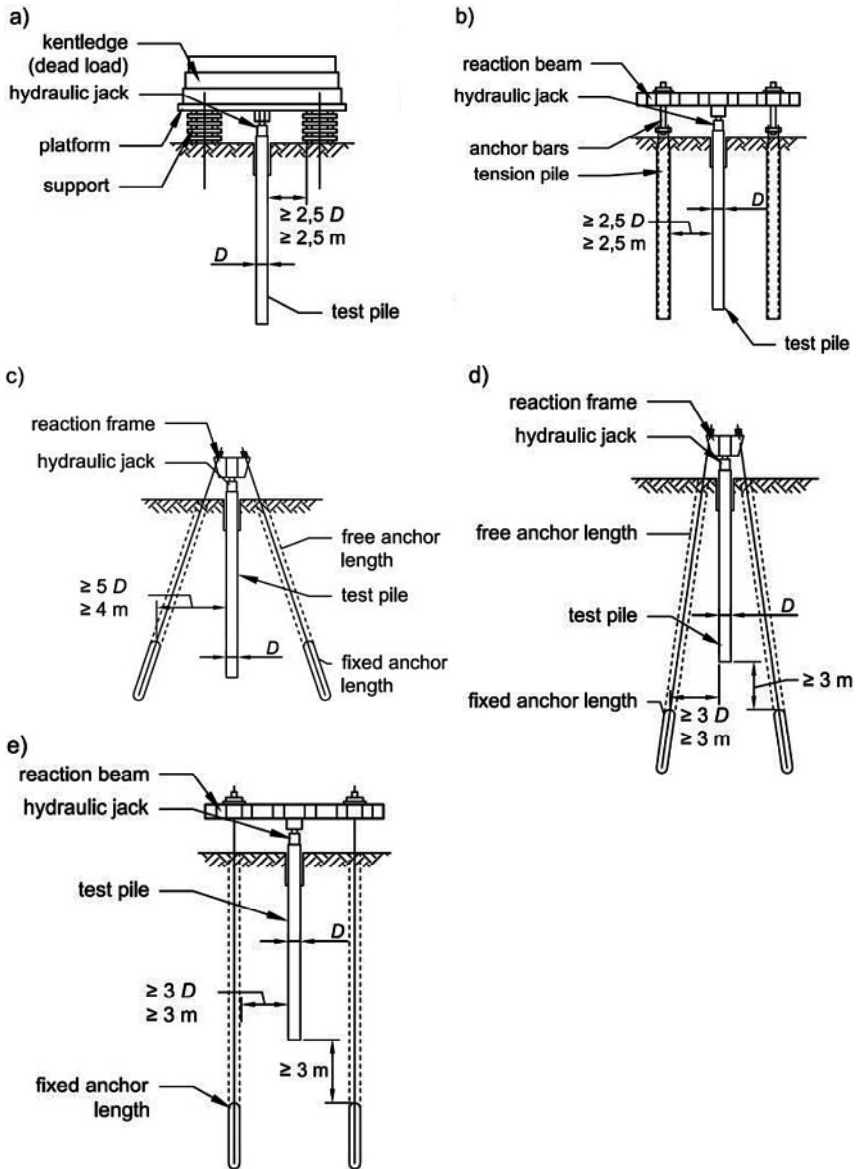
Minimum dimensions between load apparatus and test pile for compressive load tests for a) supports for kentledge (dead loads), b) tension piles, c) radial, inclined grouted anchors with shallow fixed anchor lengths, d) radial, inclined ground anchors with deep fixed anchor lengths, e) ground anchors parallel to the test pile and with deep fixed anchor lengths
